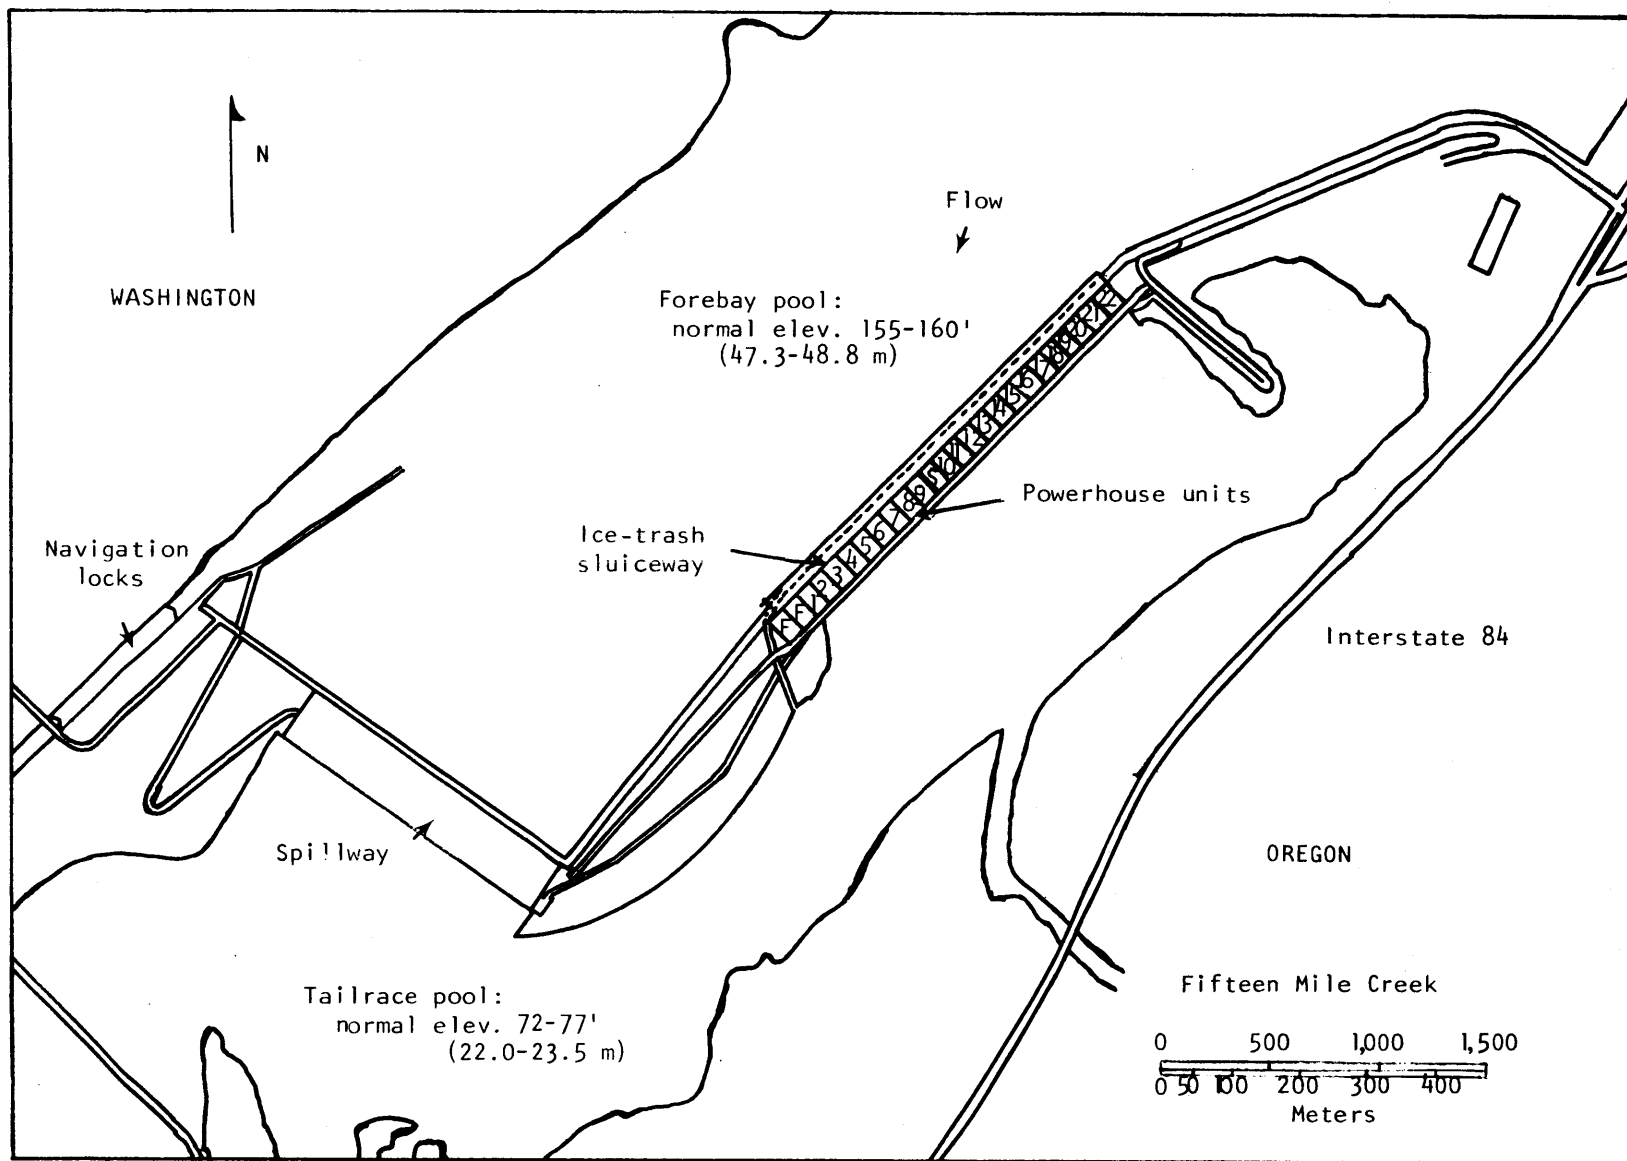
Plan view of The Dalles Dam, Columbia River.
